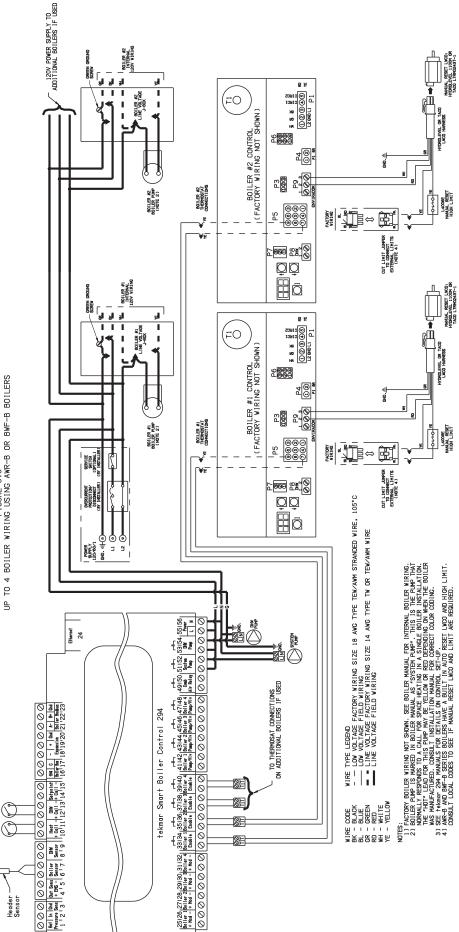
TO 4 BOILER WIRING USING AWR-B OR BWF-B BOILERS
